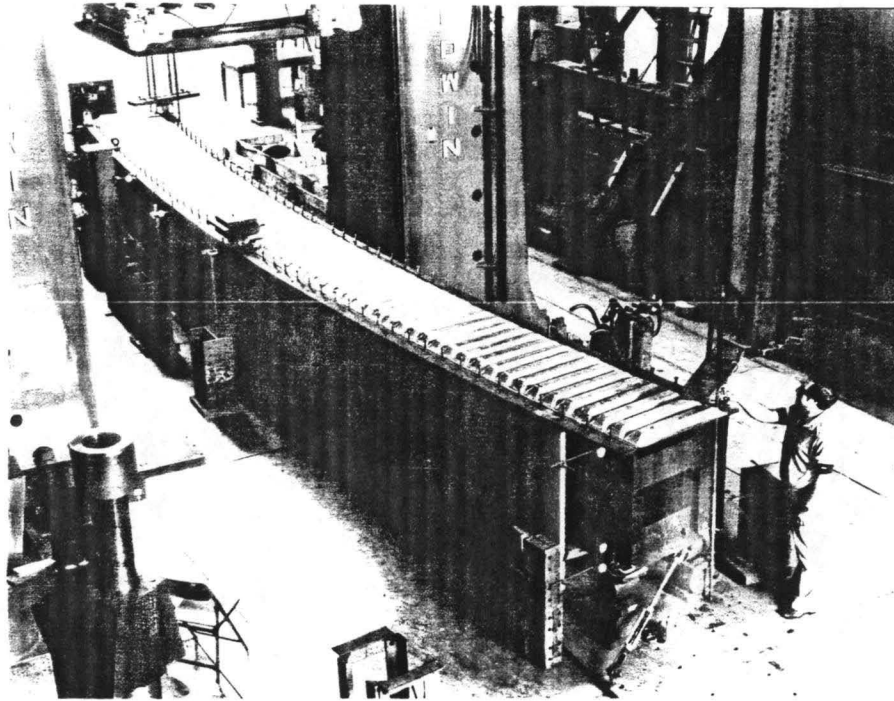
View of Box Girder with Bridge form in place prior to Testing
